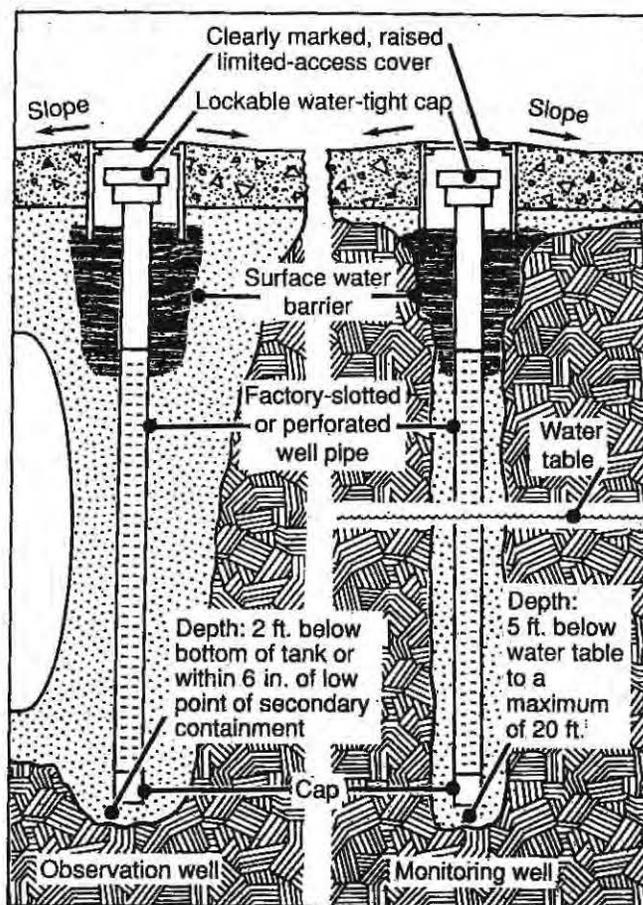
Observation and monitoring wells. While similar in construction, observation wells are used in tank excavations or secondary containment liners, while monitoring wells to monitor groundwater are installed outside the tank excavation.
